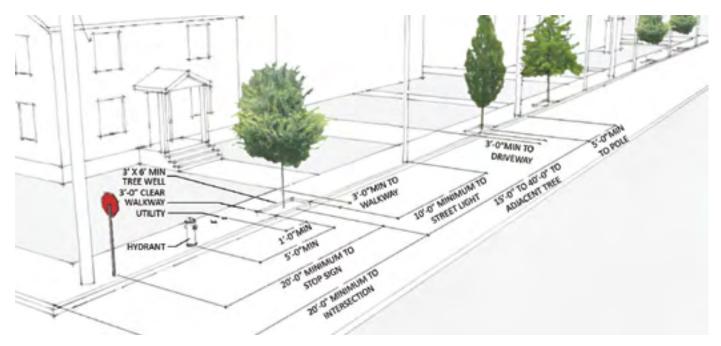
Tree planting parameters for new trees in existing sidewalks in Somerville.
